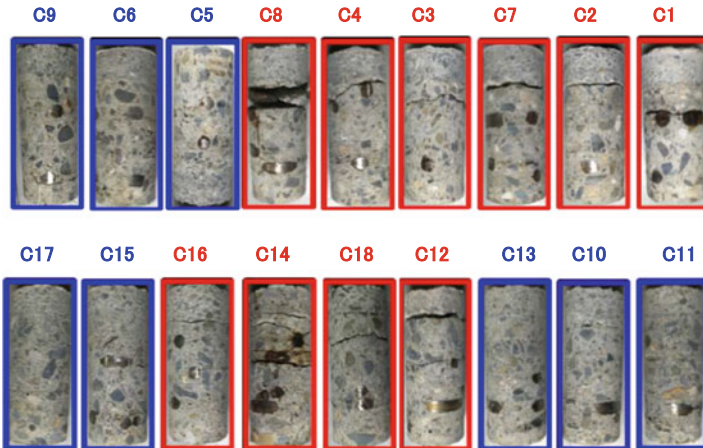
Core samples extracted from the cut-out decks (top) panel A, (bottom) panel B
